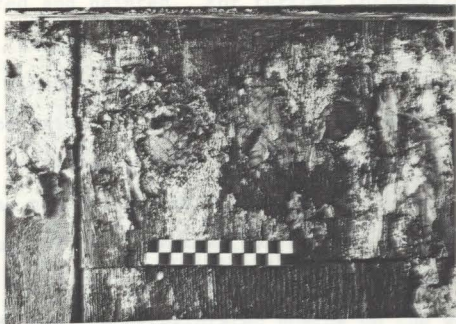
Fungal growth on the east wall of the entry hall. (scale = 6")
